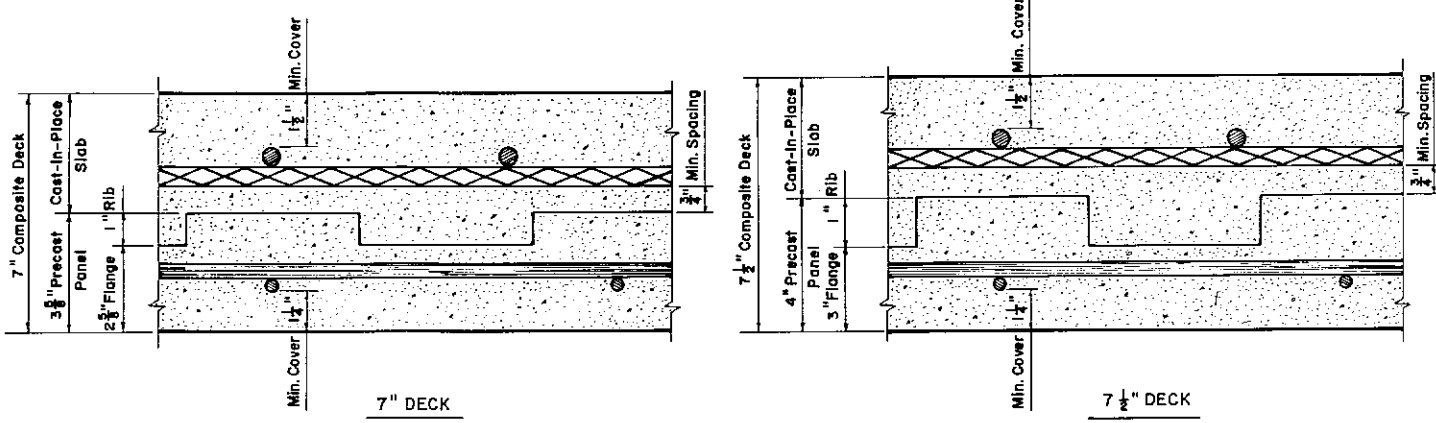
DETAIL RIBBED-PRECAST PRESTRESSED PANELS - RECTANGULAR
